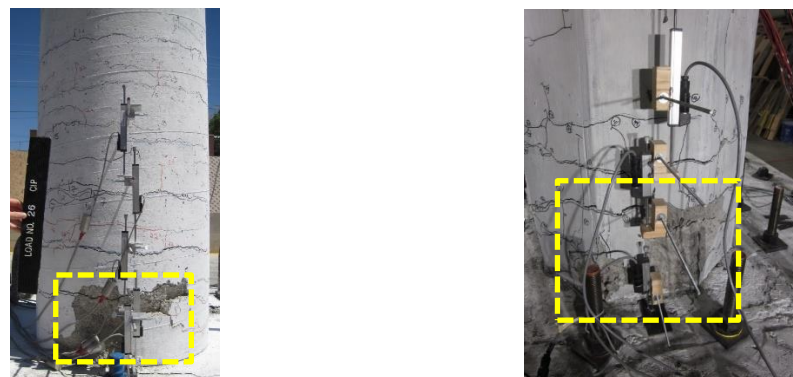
5 Samples of RC Bridge Column Condition at DS-4 [45], [46]
